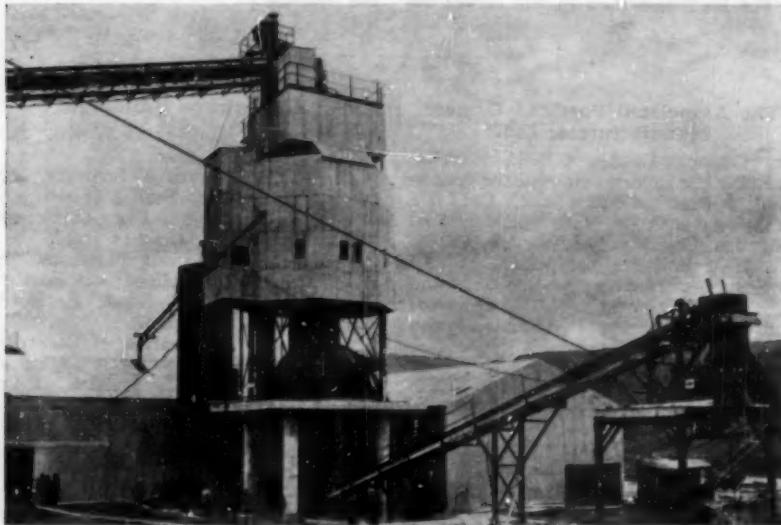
Mixing Plant, Aggregate Conveyor and Concrete Conveyor.
